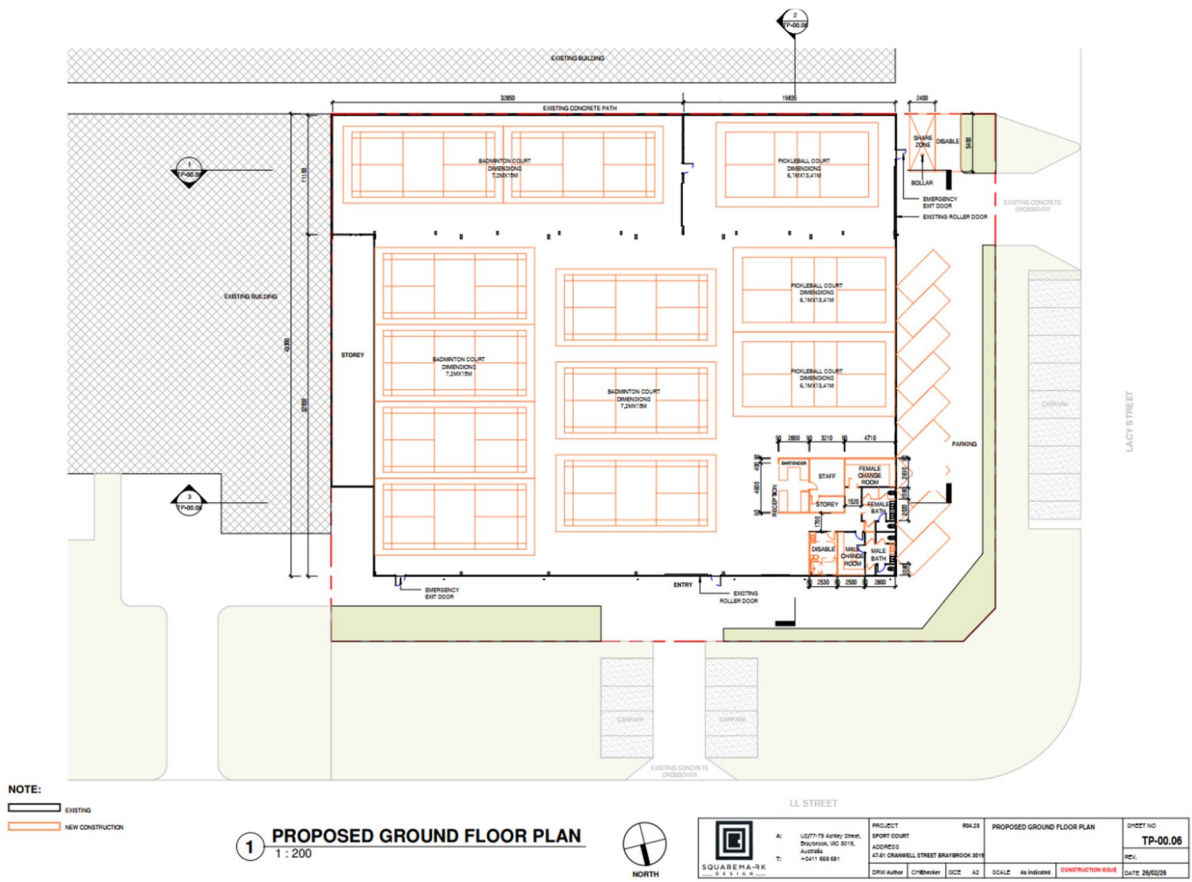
PROPOSED GROUND FLOOR PLAN (SOURCE: SQUAREMARK DESIGN)
